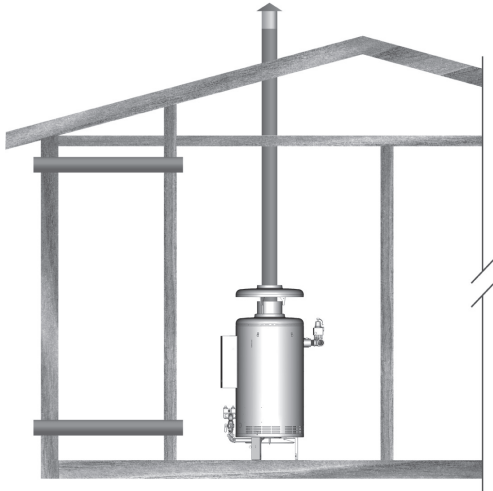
OUTDOOR AIR THROUGH TWO HORIZONTAL DUCTS
